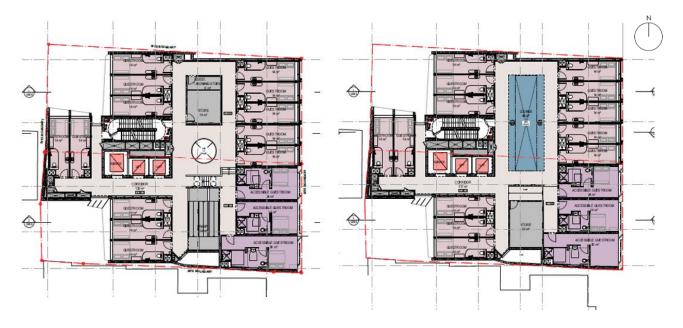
Original Scheme (11 May 2022), Proposed Level 2 Plan (left) and Level 4 Plan (right)
